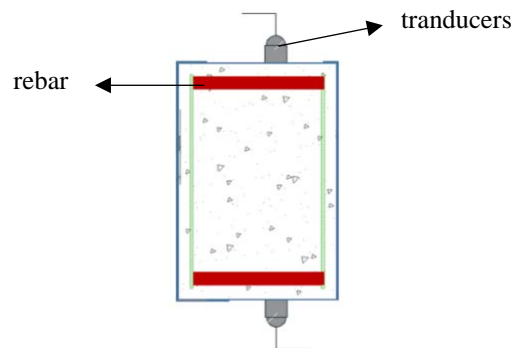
Cross-section of reinforcement concrete with rebar perpendicular with transducers
